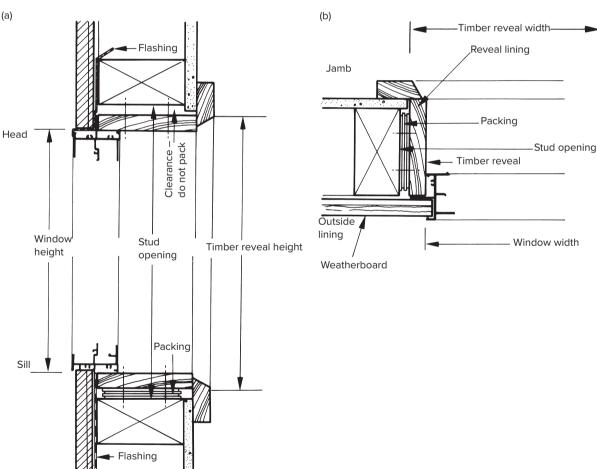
Fixing aluminium windows: (a) section through window; and (b) plan of jamb
